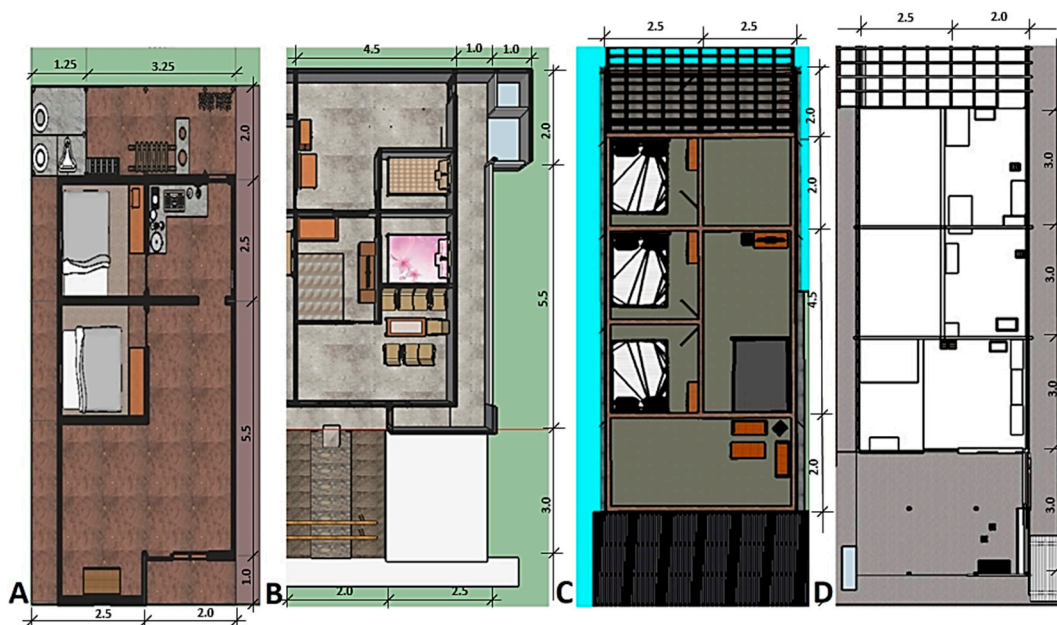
The floor plan of the sample houses: (A) exposed stone houses in the mountains, (B) wooden houses in the mountains, (C) exposed brick houses on beaches, and (D) wooden houses on beaches.
